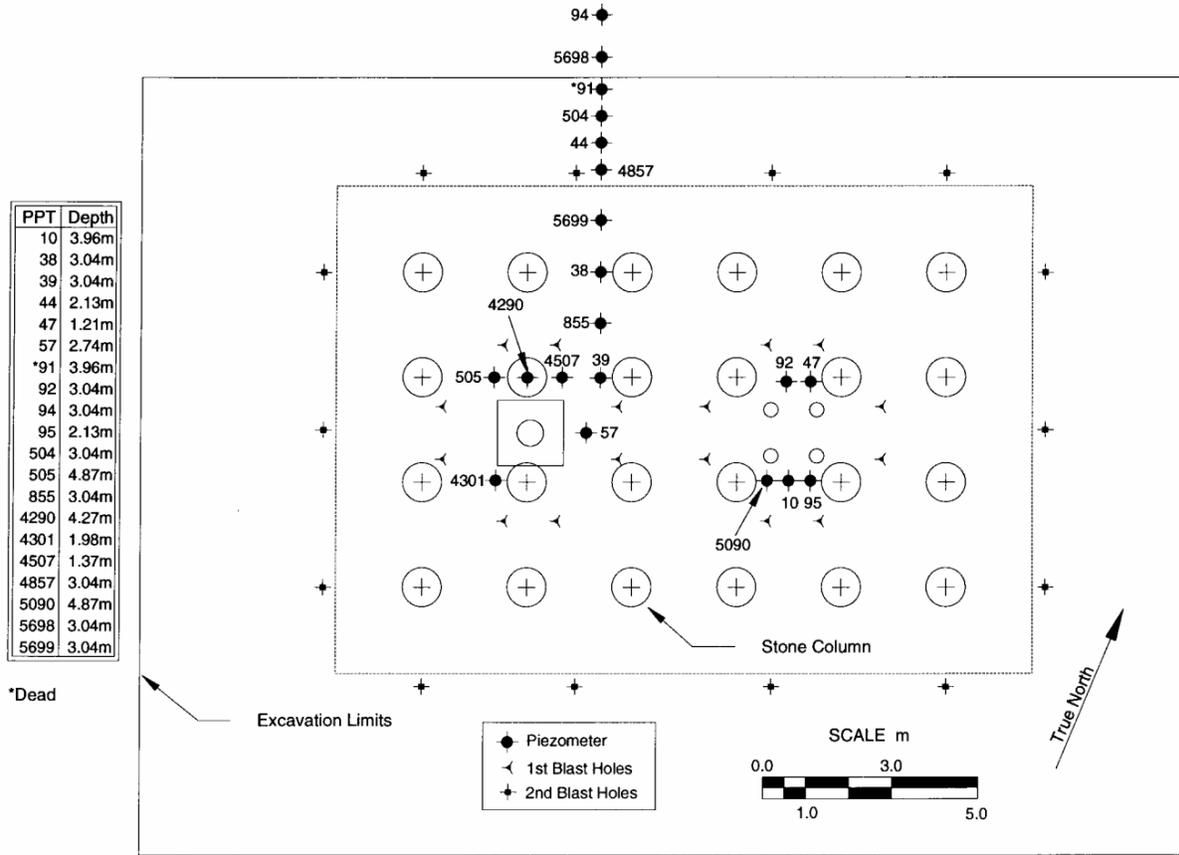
Location of Stone Columns, Piezometers, and Down-hole Explosives for Lateral Load Tests after Stone Column Installation
